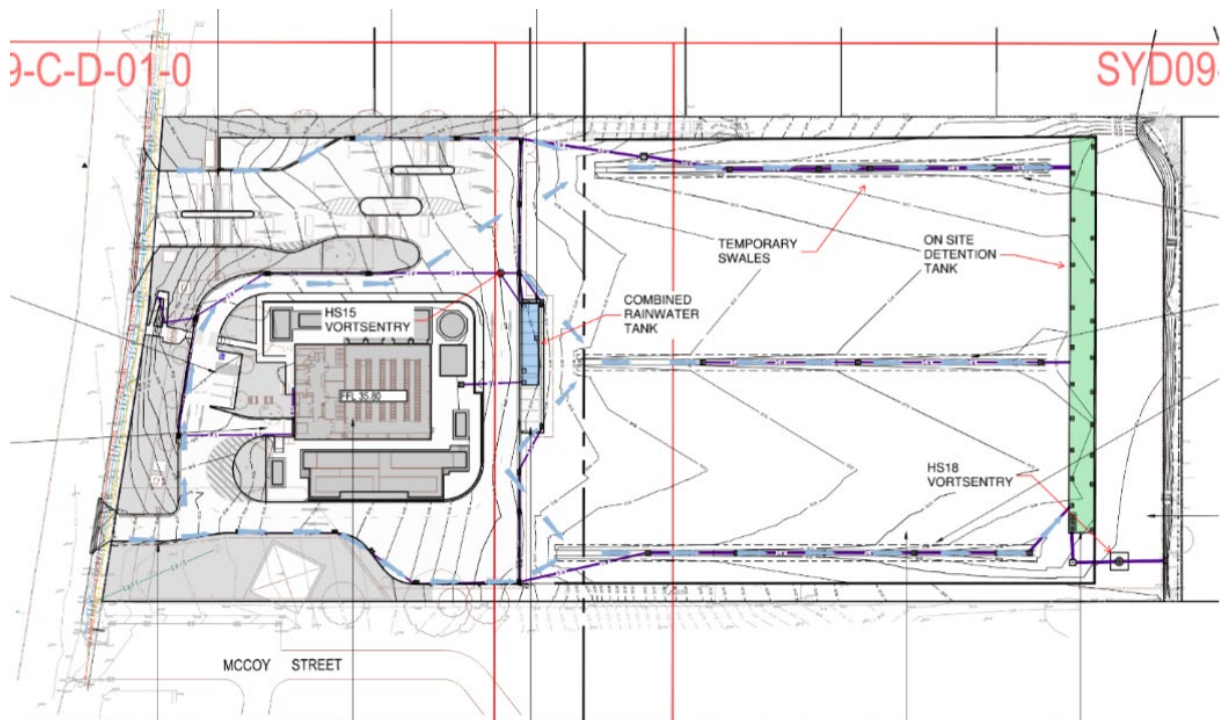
Stormwater Management Plan Approved Under DA-21-01058
